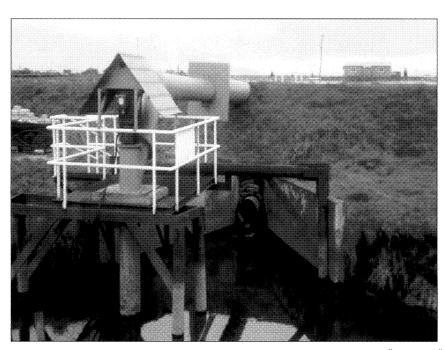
EAST DITCH: Flapgate and pumphouse (Centre Slough between 88th and 80th Street)
